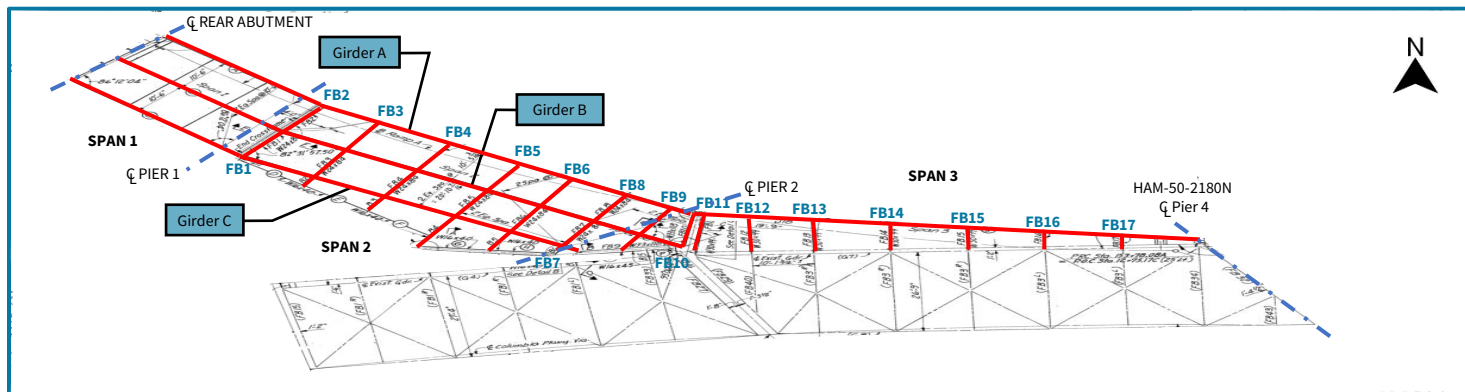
HAM-50-2181N Bridge Nomenclature (Framing Plan Layout and NSTMs – Spans 1 to 3)
